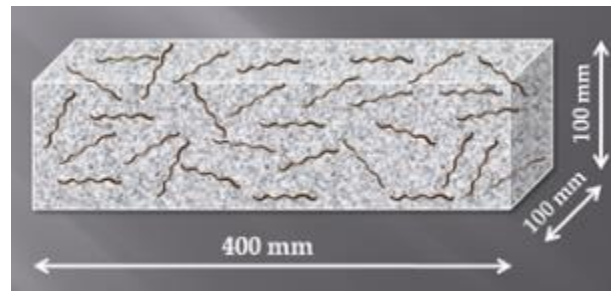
Dimensions of fiber-reinforced concrete specimen
